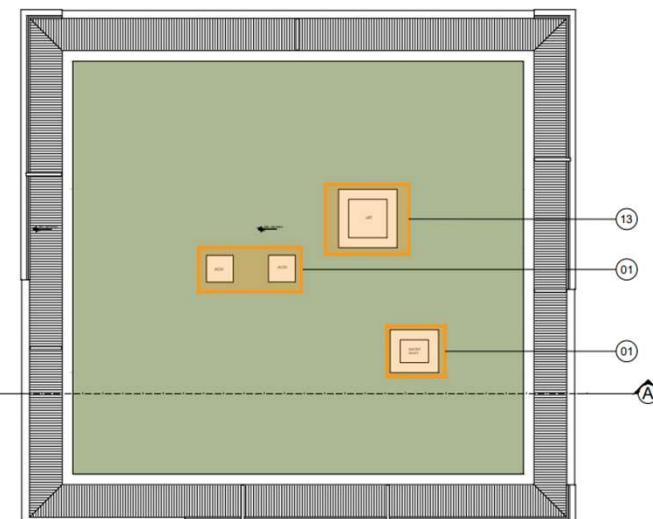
Existing Roof Plan – Extracted from Existing Scheme
